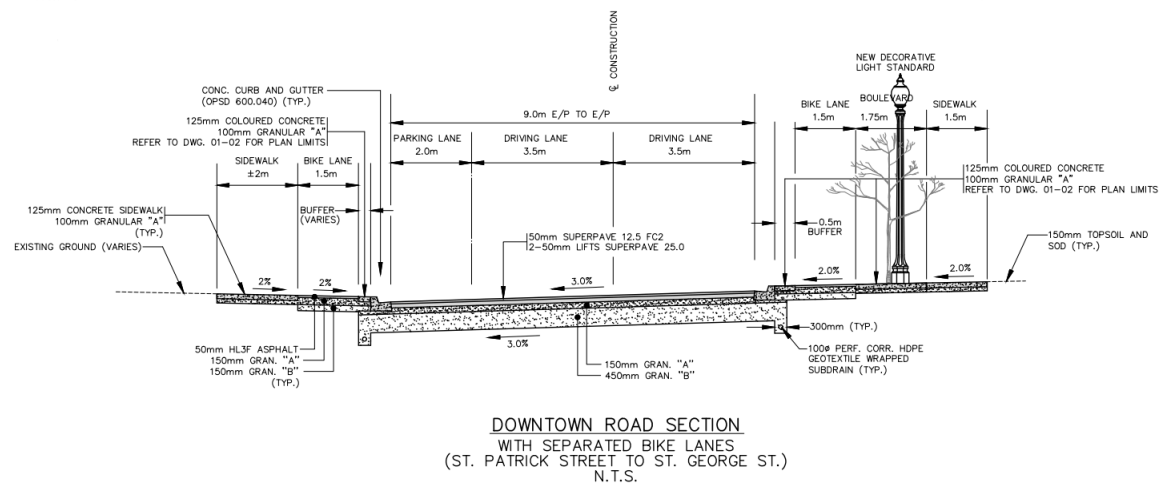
St. David Street Reconstruction Project - Downtown Fergus Road Cross Section [5]
